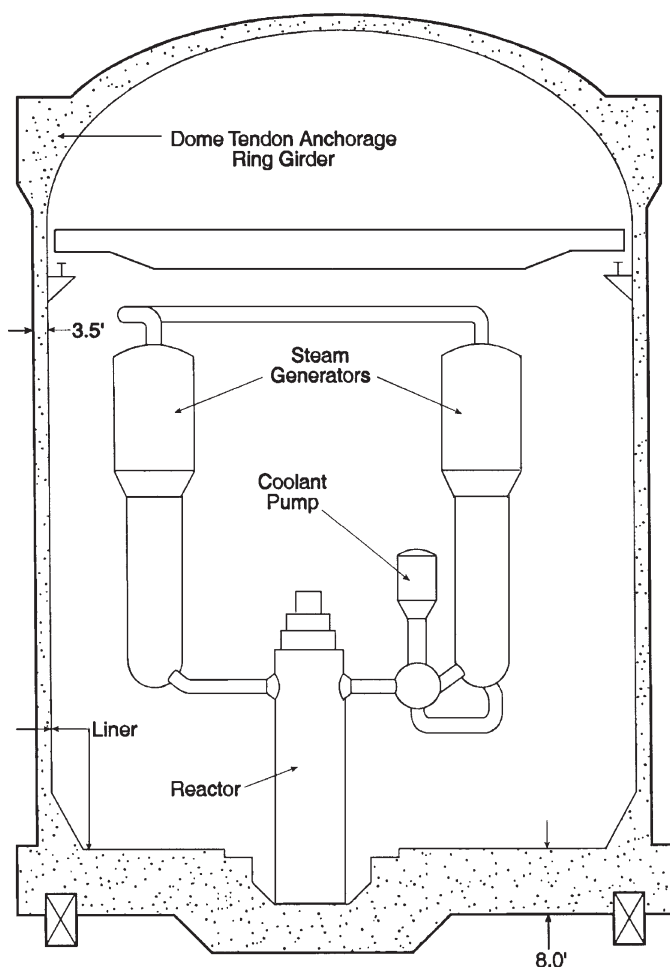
SMALL PWR PRESTRESSED CONCRETE CONTAINMENT
